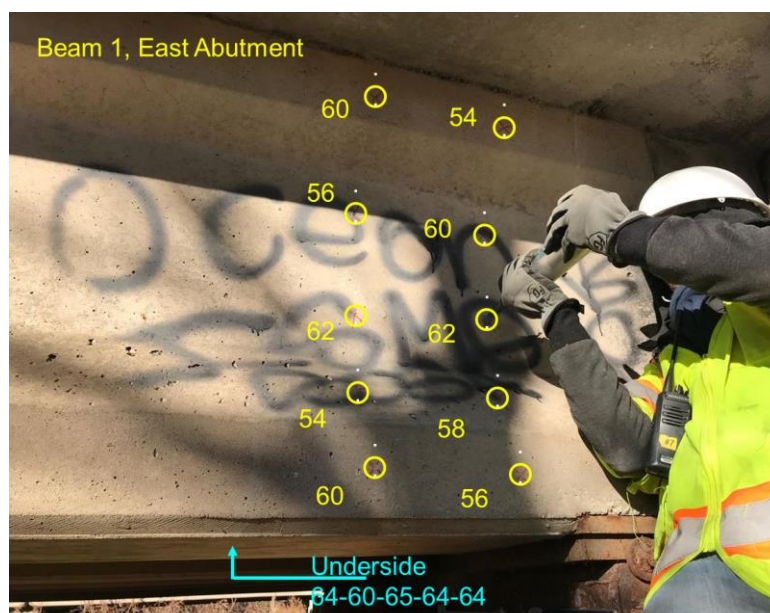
Schmidt Hammer Testing (Photo provided by AID Inc.)
